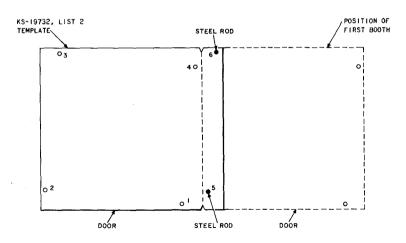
Right to Left Layout for Drilling Mounting Holes
